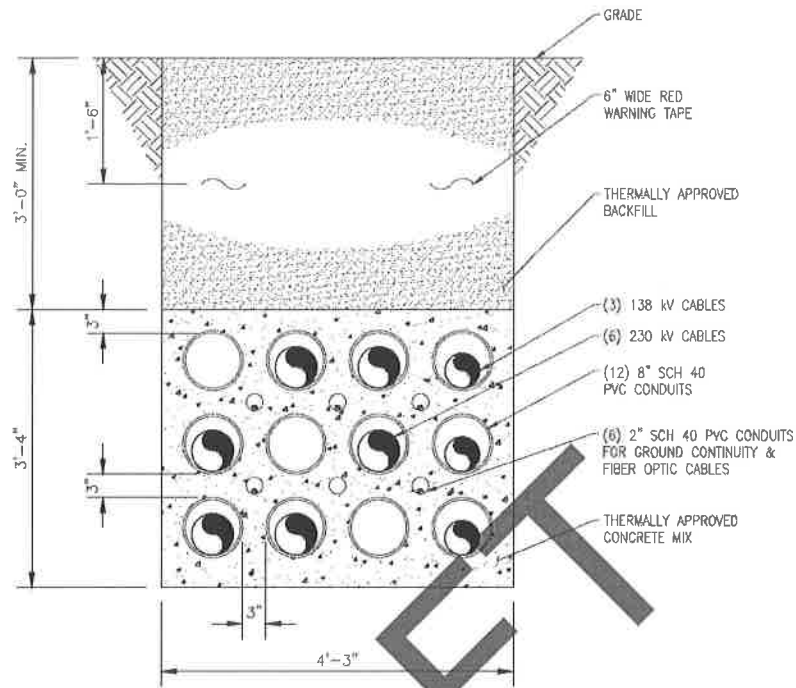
Preliminary 3X4 Duct Bank Detail
